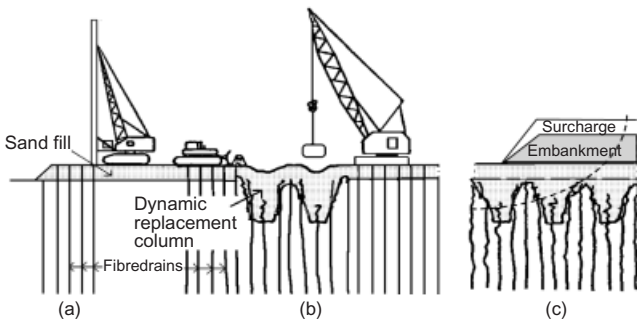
Sequence of soil treatment in embankment construction: (a) PVD installation; (b) heavy tamping; (c) surcharge
